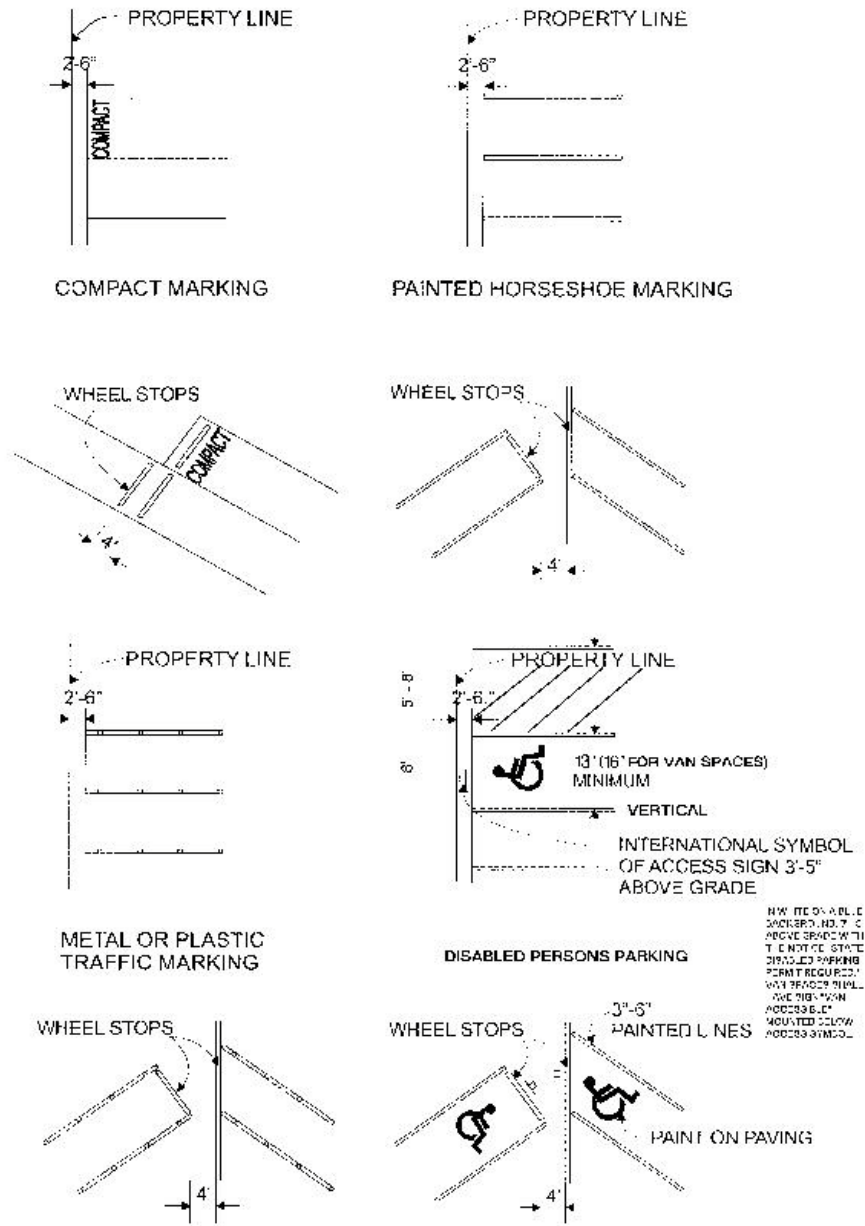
(F): Pavement marking and wheel stop standards.
